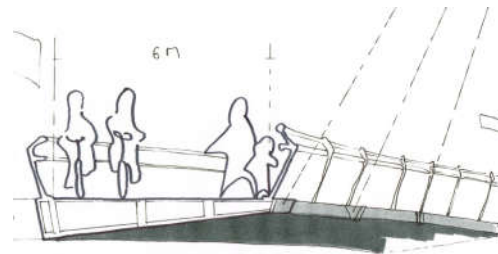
Cross section for the proposed cable stayed bridge solution (Sketch by BEaM).
